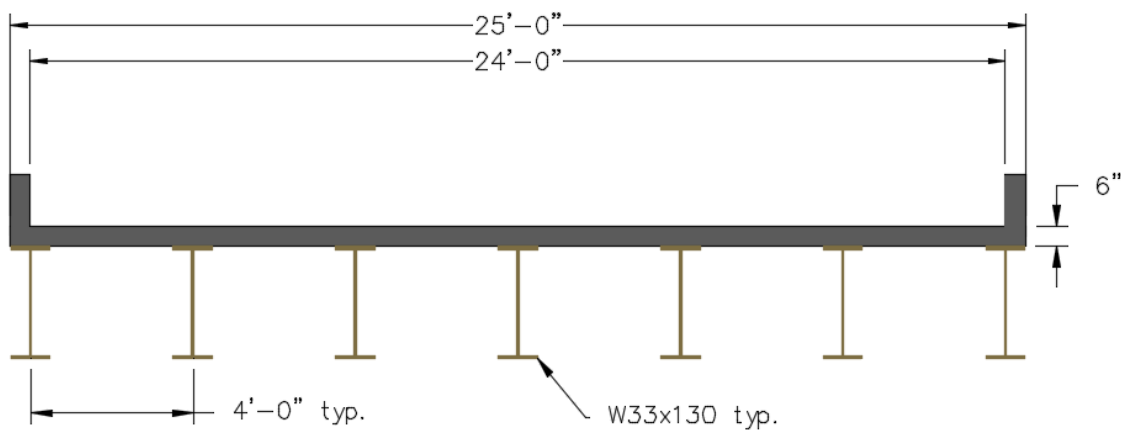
Transverse Section of Bridge SM-21 (Adapted from TxDOT 2018b)
